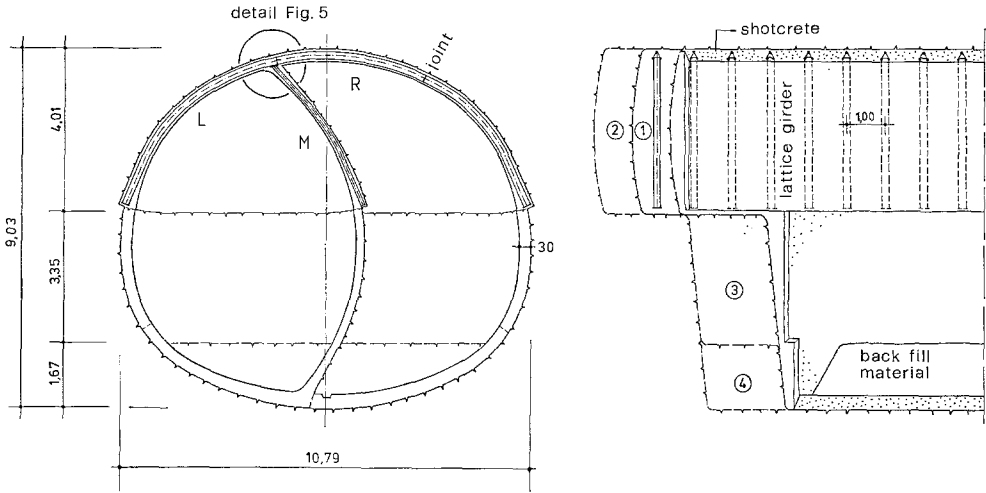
Constructional method used for the cross-section at a station of the line U 5/9 of the Munich Underground
